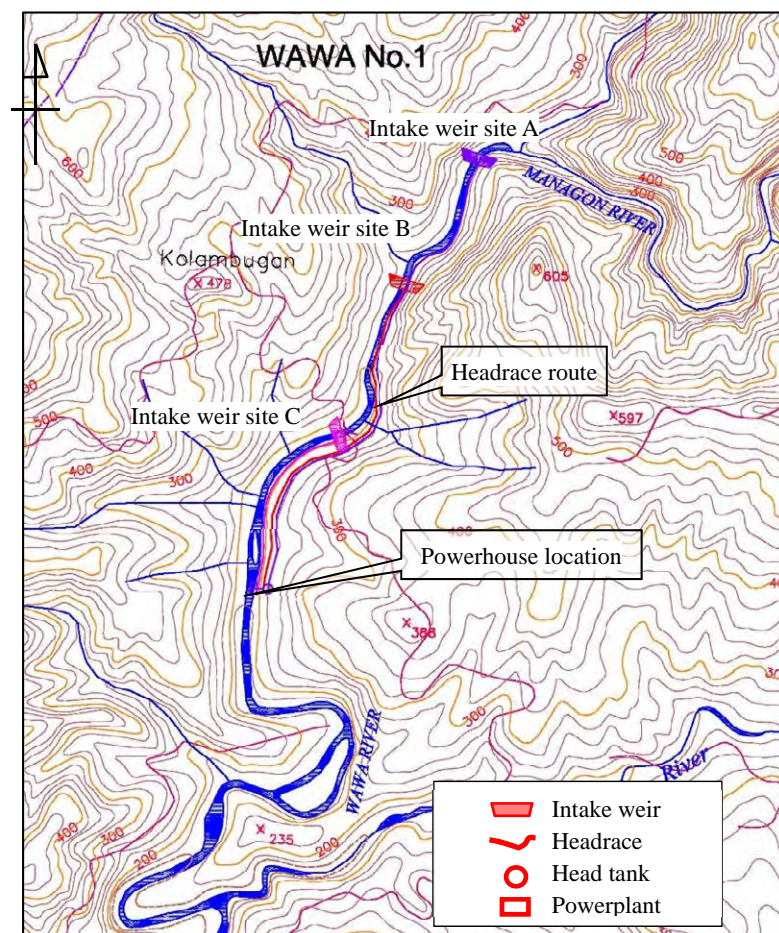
Proposed layout for Wawa No. 1 power plant
